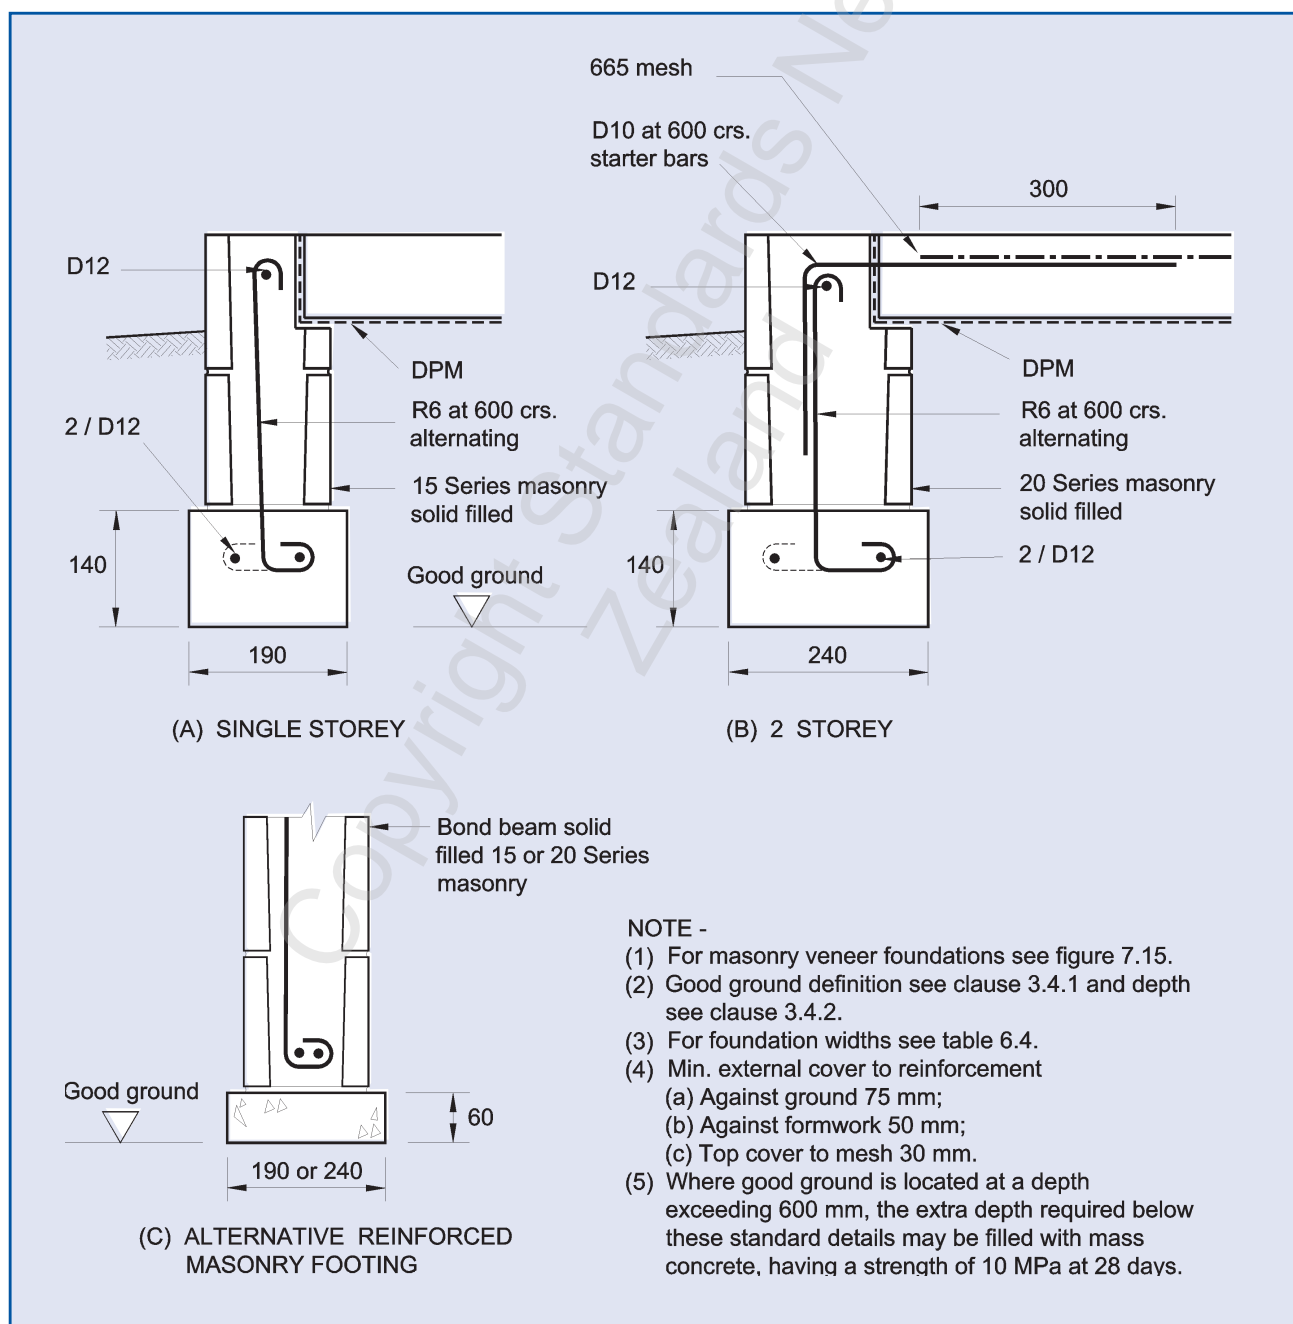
Foundation edge details – Concrete masonry (see 7.5.2.3)
